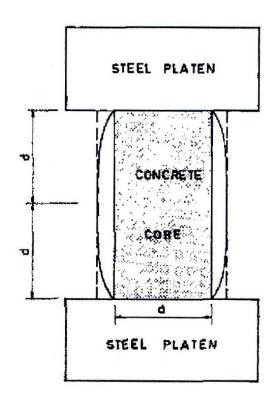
Deformation of concrete core relative to steel platens (Chung 1979)
